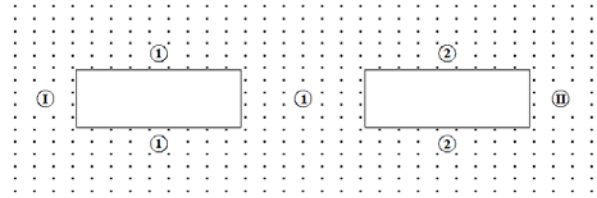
Two rectangular mining chambers in rock massive and their elements: I, II- barrier pillars; 1- interchamber pillar; 1, 2 - roof and floor of chambers
